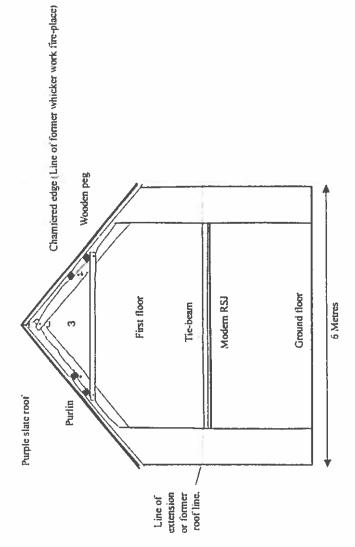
Gelli-Gron, Tregaron.Cross-section of roof elevation, showing A-frame and chamfered edges of former whicker work fireplace..
